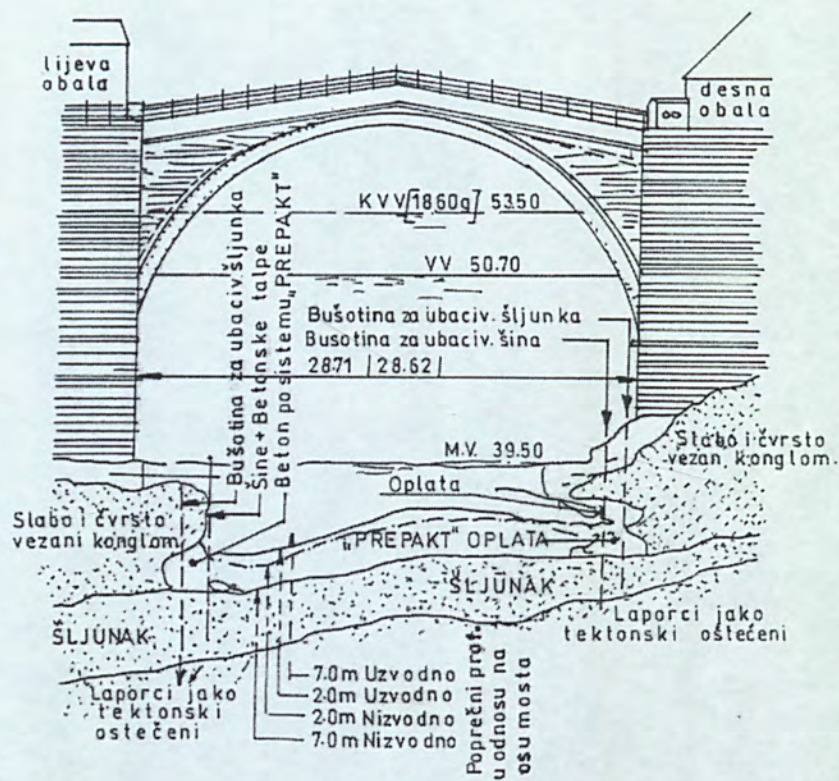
Schematic presentation of soil structure with “caves” below abutment of the Old Bridge
